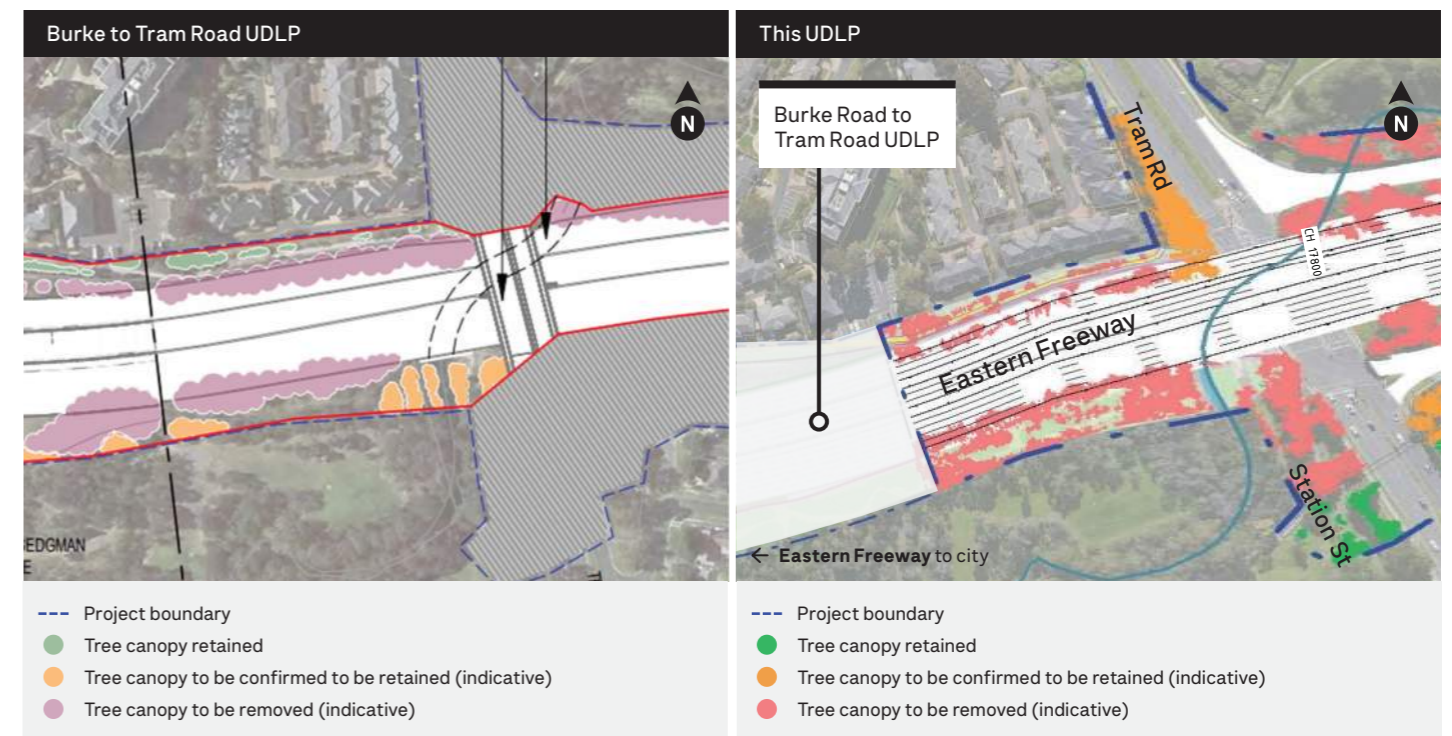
Tree canopy removal plan in Eastern Freeway Upgrades – Burke Road to Tram Road UDLP and this UDLP
